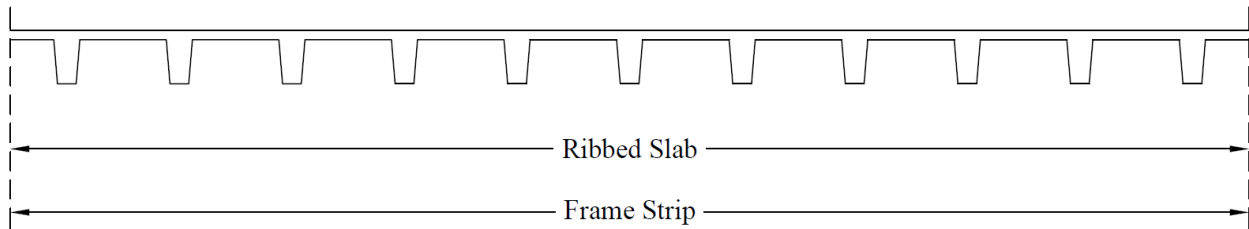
Frame Strip Cross Section (at Distance d from the Face of the Drop Panel)
